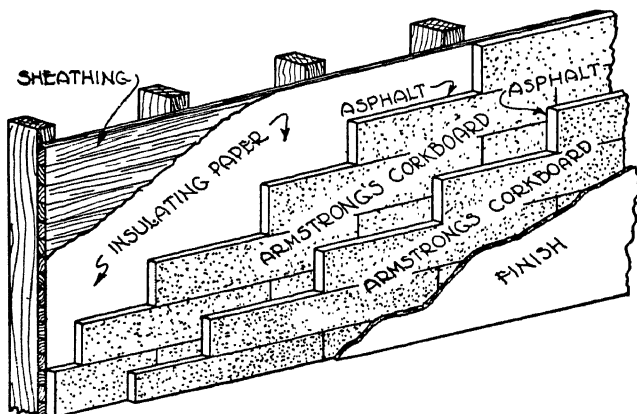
B. Wood Wall with Two Layers of Corkboard Applied in Asphalt
